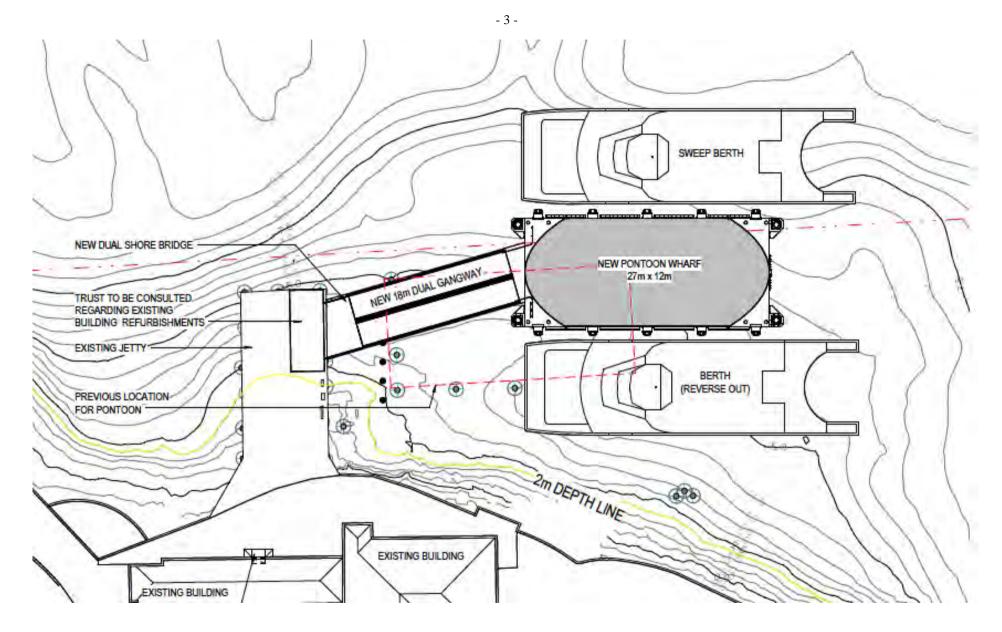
Site Plan for the Proposed Cockatoo Island Wharf
